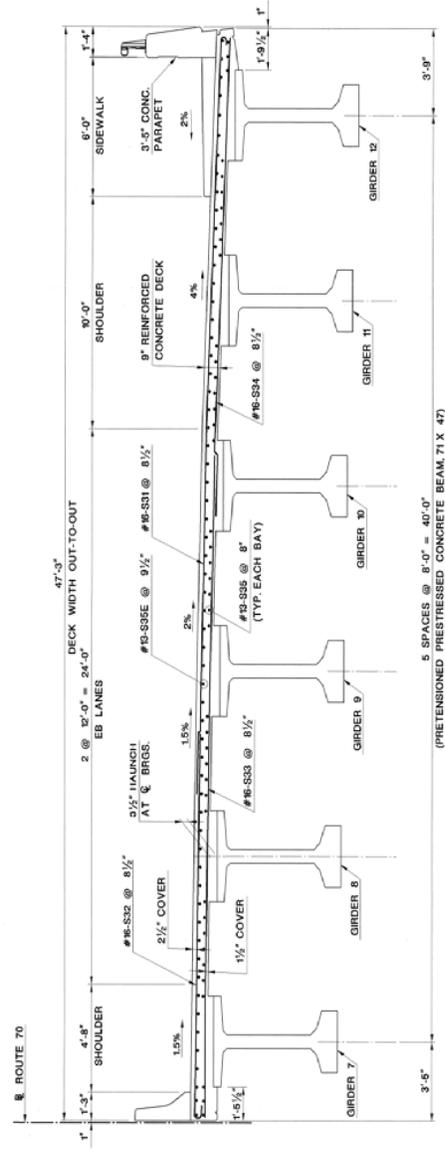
Typical Deck Section (Route 70 Eastbound)
